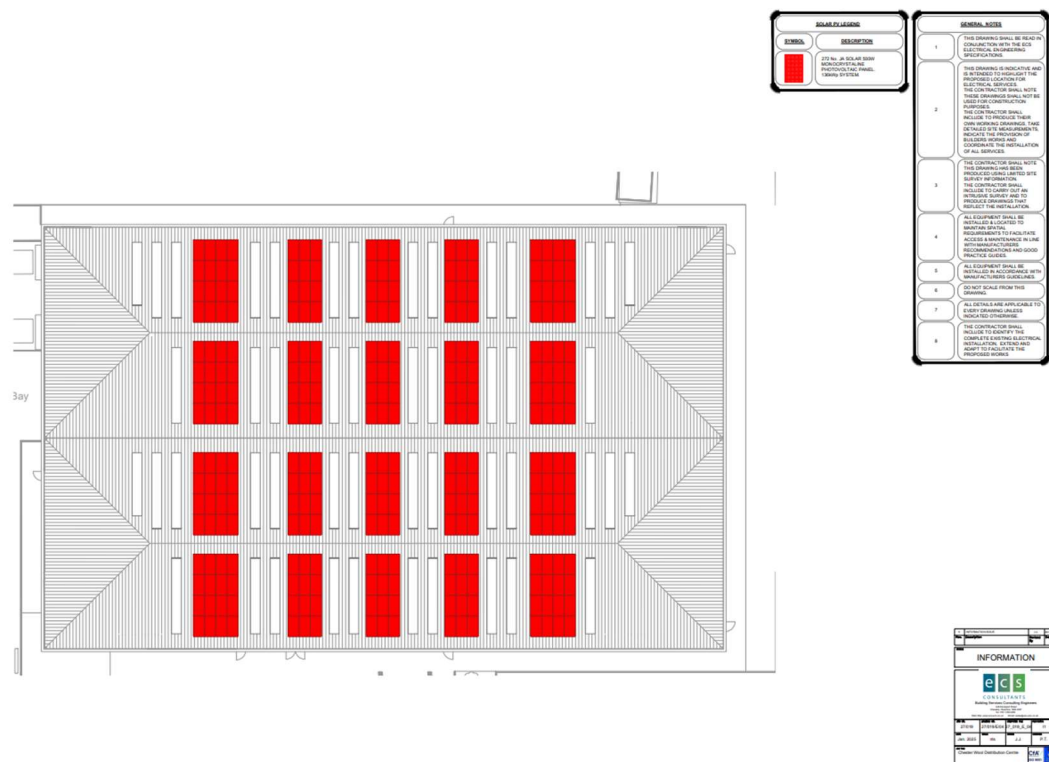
Proposed External Electrical Services Layout [source: ECS]
